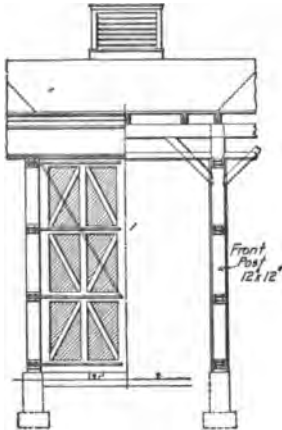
a* and *b*. Elevation of End Walls and Cross-section of Round House at Decatur, Ill., Wabash Railroad.
